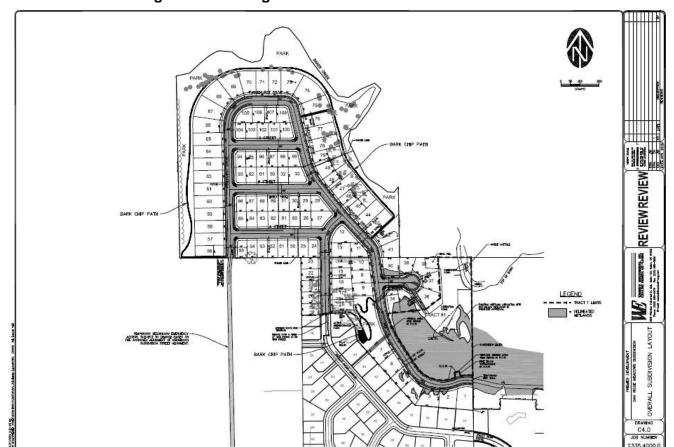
Oak Ridge Meadows Tentative Subdivision Plan
